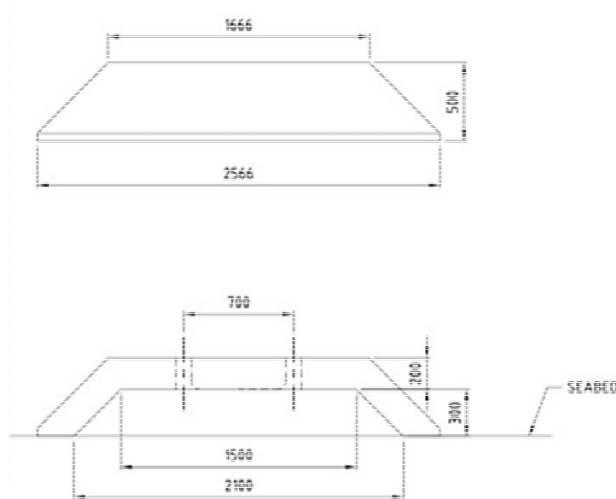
Example of subsea cap layout and dimensions (in mm)
